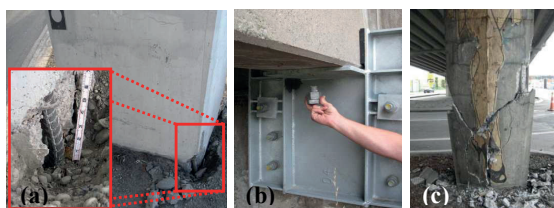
a) Buckling of reinforcing steel at the base of the central pier of Port Hills Overpass; b) Sheared bolt at the abutment retrofit of Horotane Valley Overpass; c) Shear failure of the column of Moorhouse Ave Overbridge
